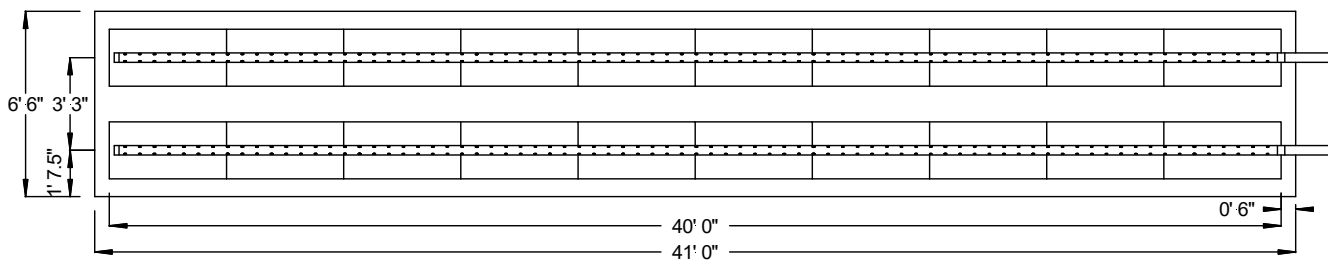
SECTION VIEW – BED SYSTEM EXAMPLE
